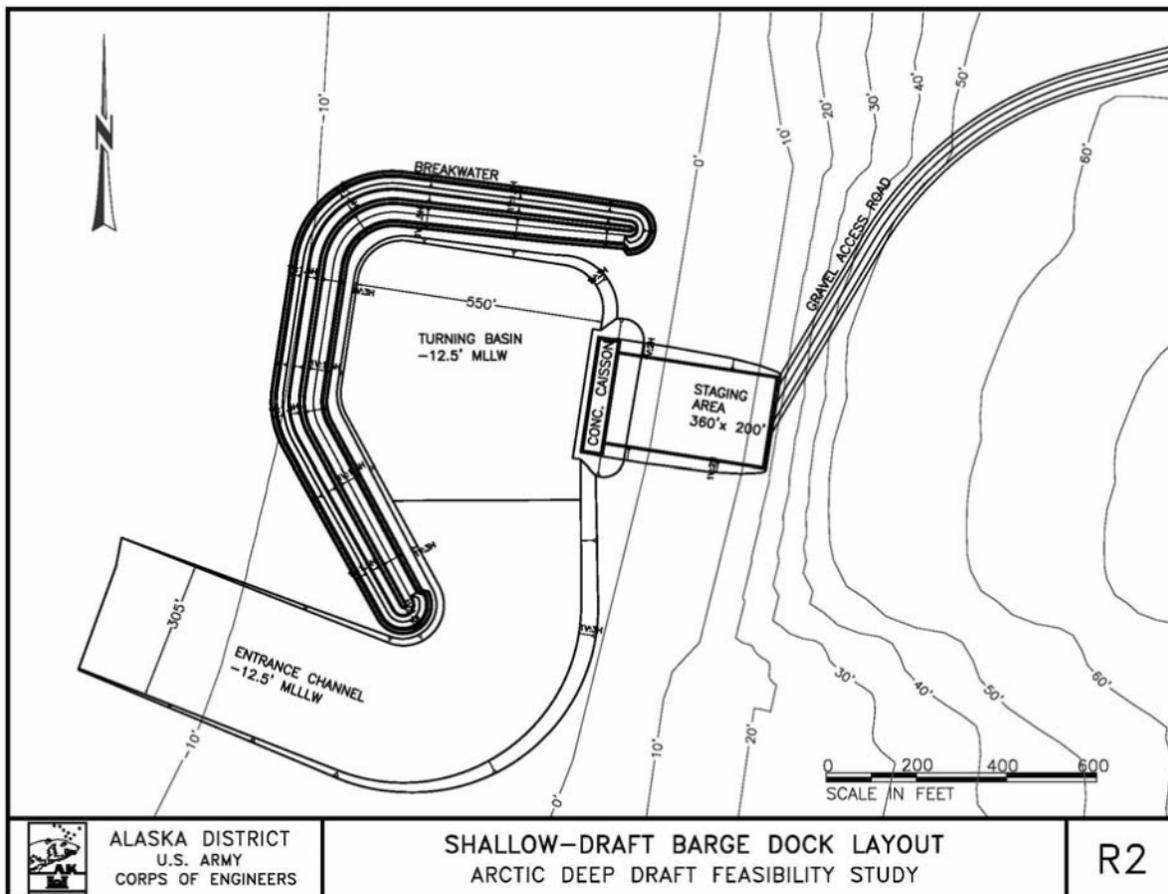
Preliminary Cape Riley layout. Source: USACE (2013).
